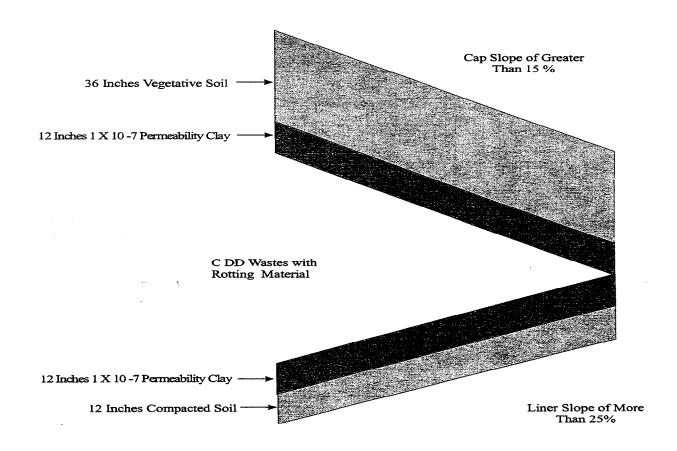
Construction-Demolition Debris Landfill Putrescible Wastes Design Cross Section On Slopes
